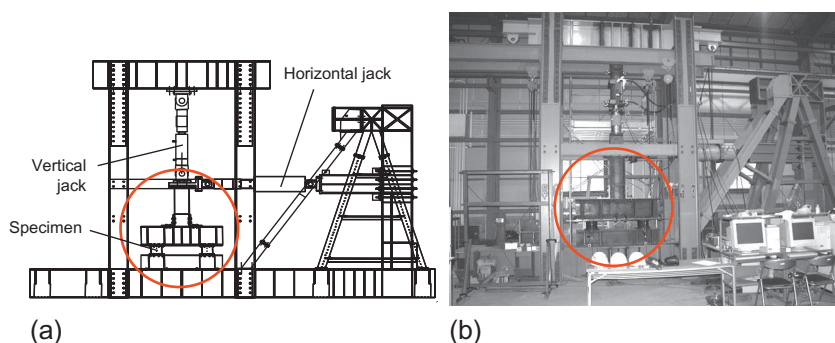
Test setup: (a) test specimen and loading frame, (b) view of test setup.
